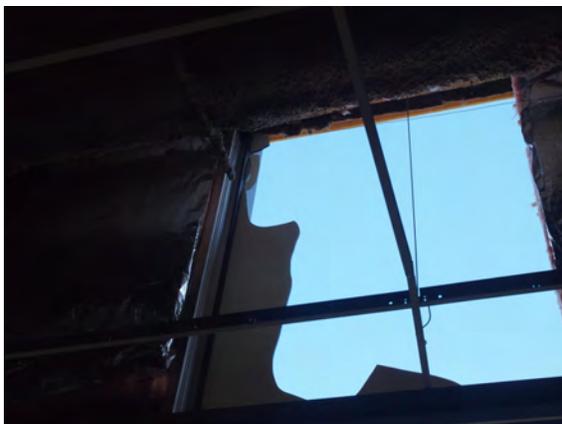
View from interior of additional glass that had fallen below the floor level.
